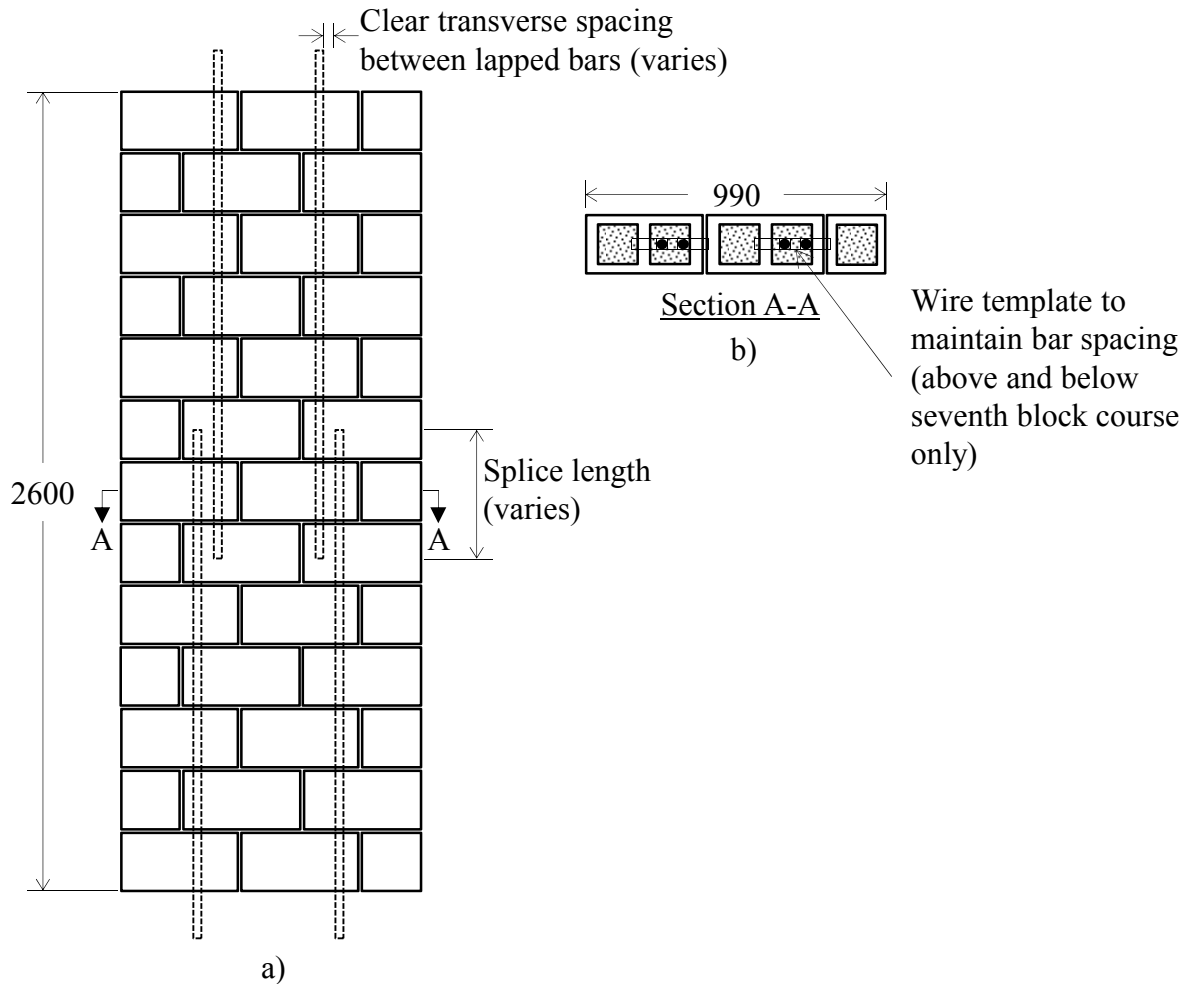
Wall Splice Specimen Geometry: a) Elevation; b) Cross-Section Within the Lap Splice Length
